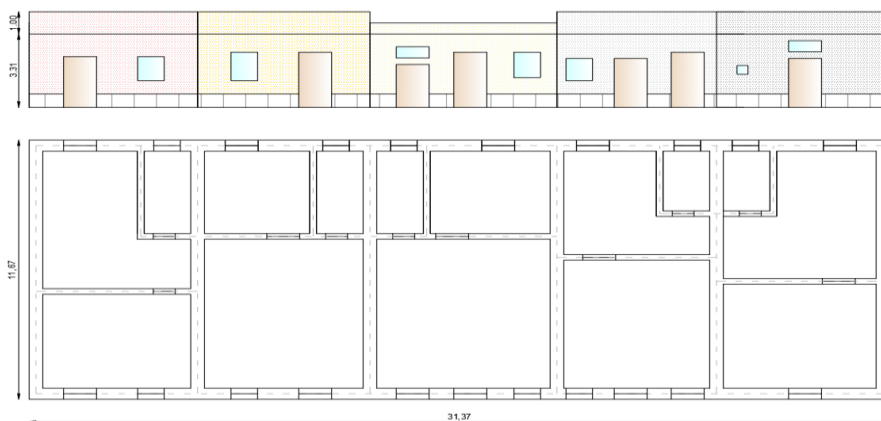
Drawings of the surveyed row masonry aggregate. From the top to the bottom, elevation view of the buildings and planimetric distribution of masonry panels. Reported measures are expressed in meters limited to the base area sides and height of the focused masonry aggregate.
